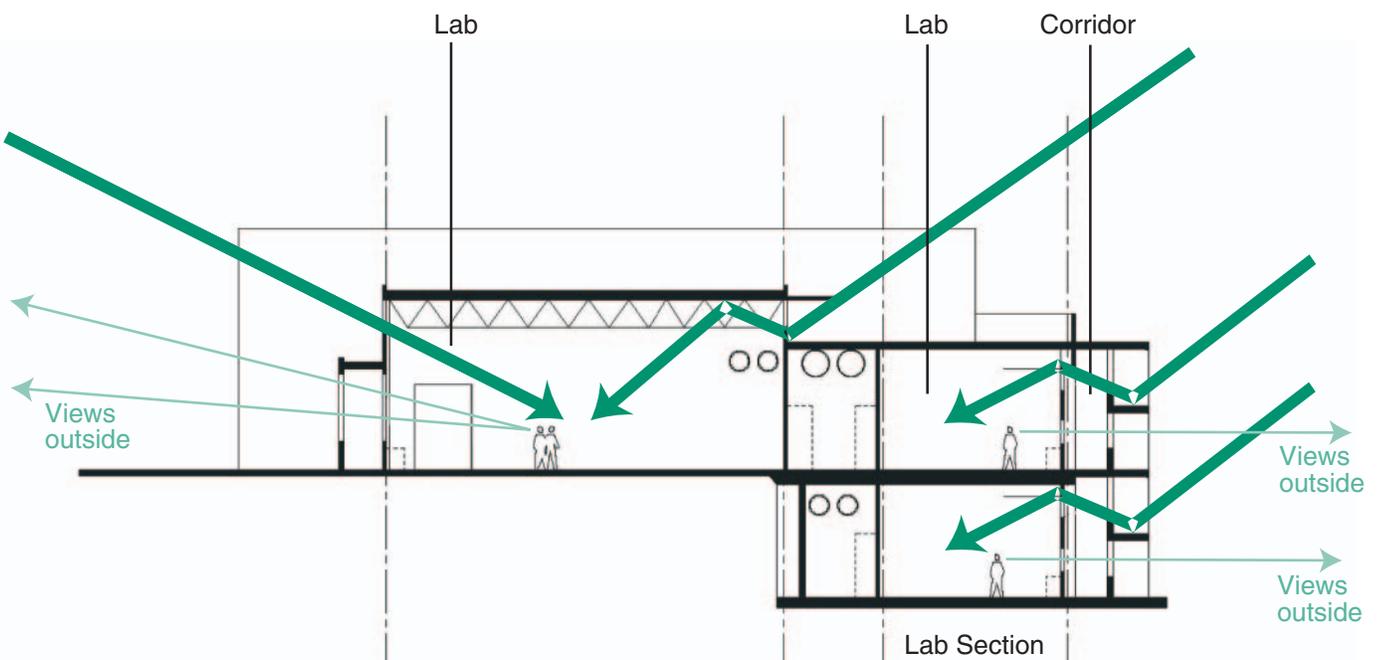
Daylighting will enter NREL's planned lab building primarily through clerestory windows on the north and south. Labs will also have windows for views to the outside.
